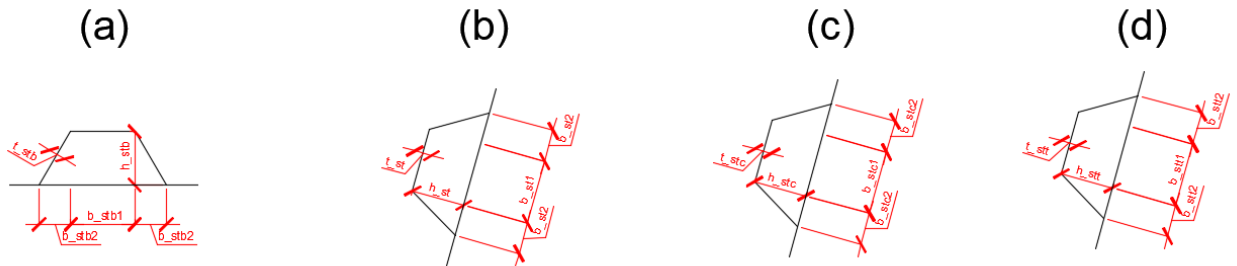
detail of the stiffeners - bottom plate stiffeners (a) - bottom web stiffeners (b) - central web stiffeners (c) - top web stiffeners (d)
